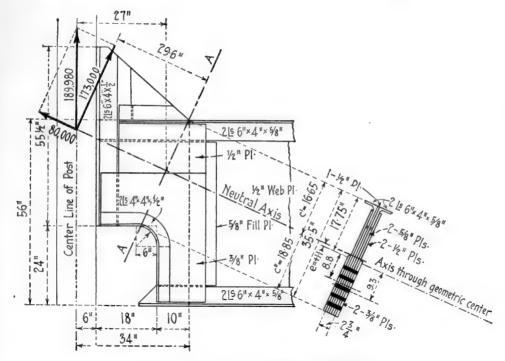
DETAIL OF FLOORBEAM CONNECTION.
